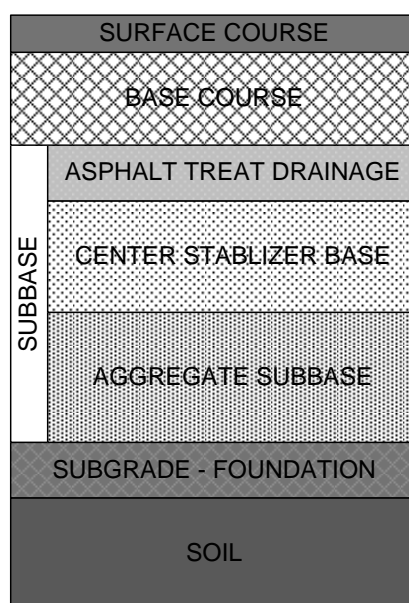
3 Example of Flexible Pavement Structural Layers
